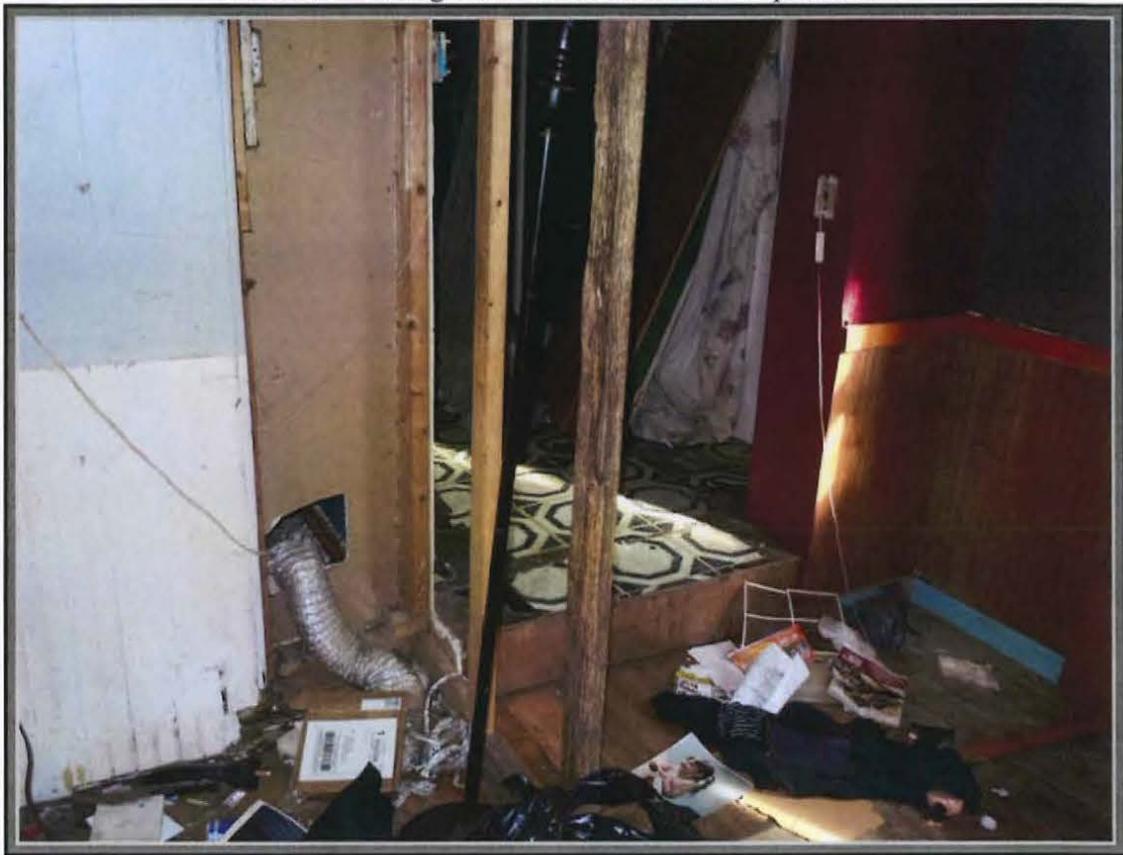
Damage to walls with exposed wiring not installed in accordance with Code.
